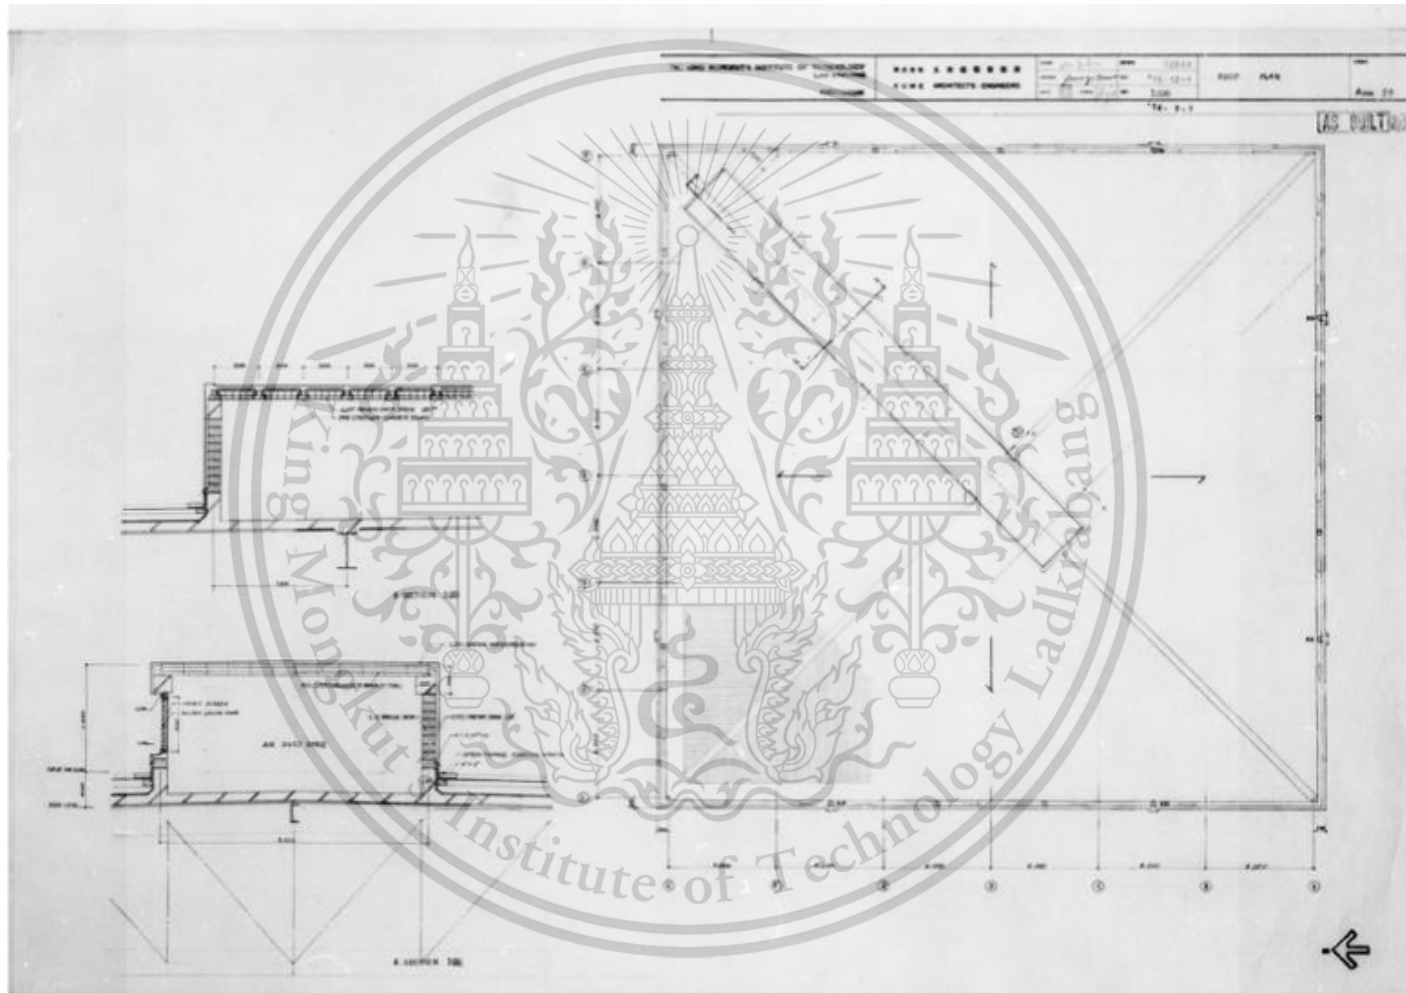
Original drawing of The auditorium (Roof Detail)
